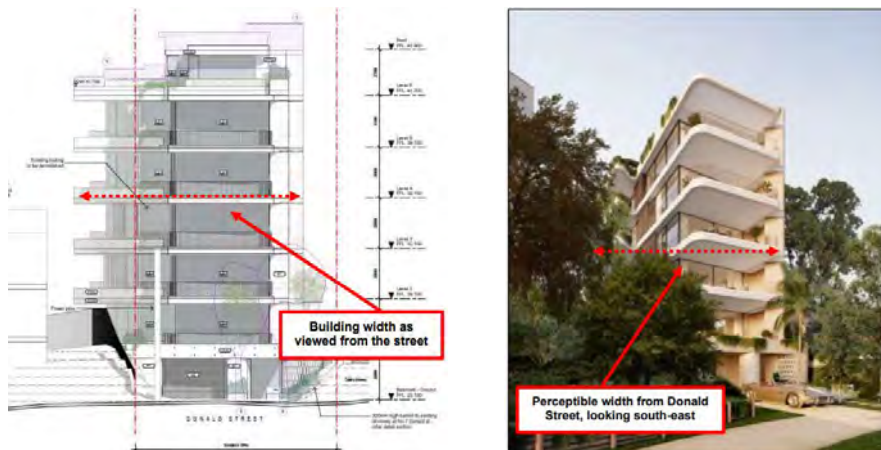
Elevation and photomontage of building from Donald Street, Nelson Bay
